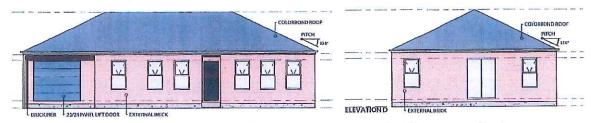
Proposed elevations facing King Street (LHS) and Main Road (RHS), as per application.
